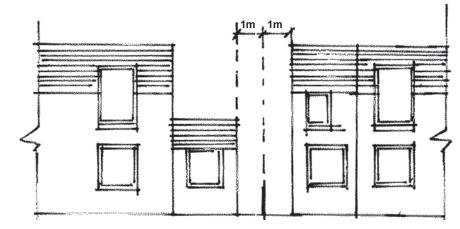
A minimum of 1 metre must normally be retained between the new side wall of the extension and the boundary of the site to prevent a terracing effect
